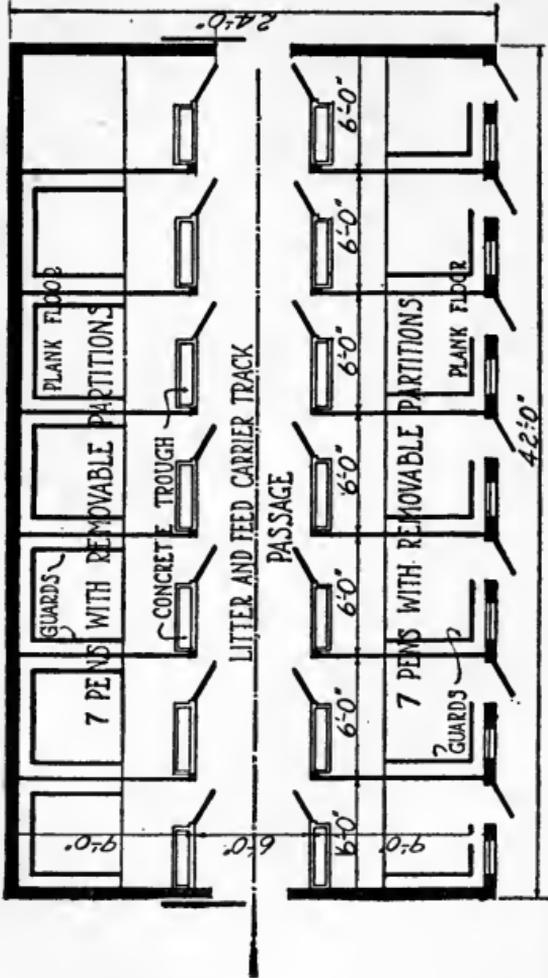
Floor Plan of Winter Hog House, Showing the Arrangement of Pens and Gates
